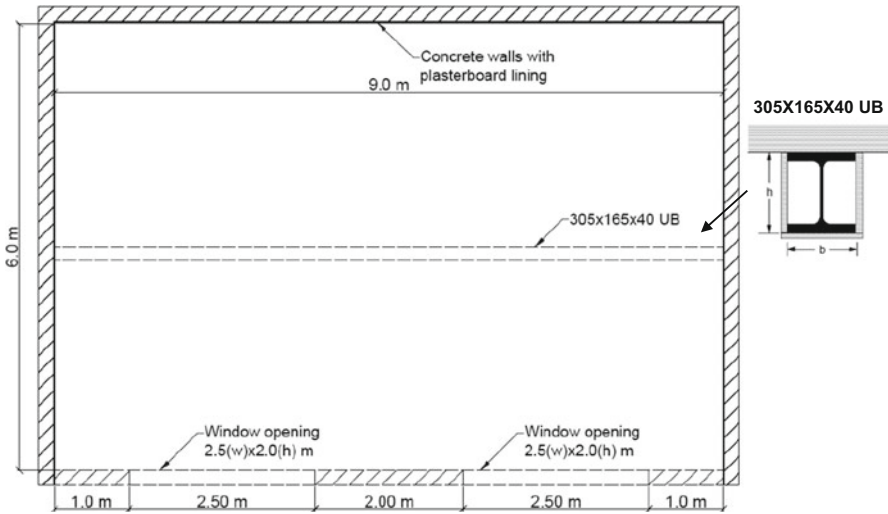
Plan showing the fire compartment and location of central protected beam
